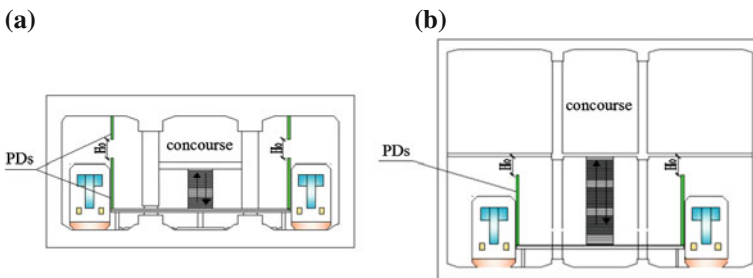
Structure section of inland-type station. a One floor inland-type station. b Two floors inland-type station
